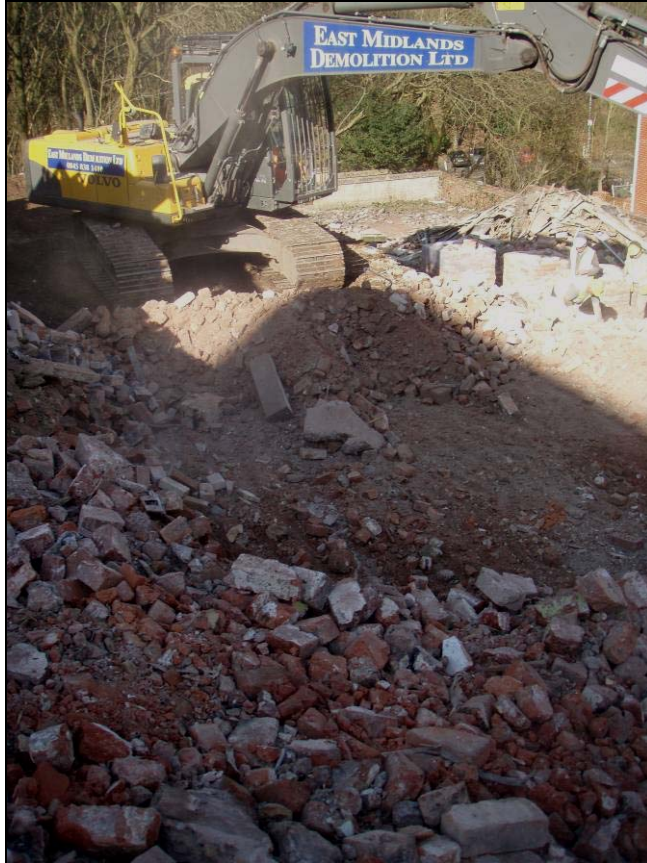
General view of the excavation of the Mill's ground floor, looking north.
